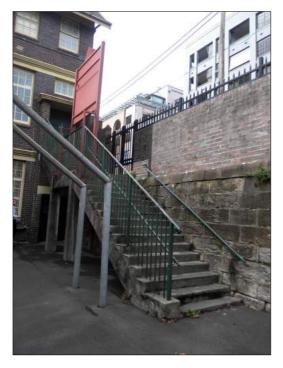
Southern elevation of Building 3, showing the stairs at the eastern end leading from the courtyard to ground floor level.
